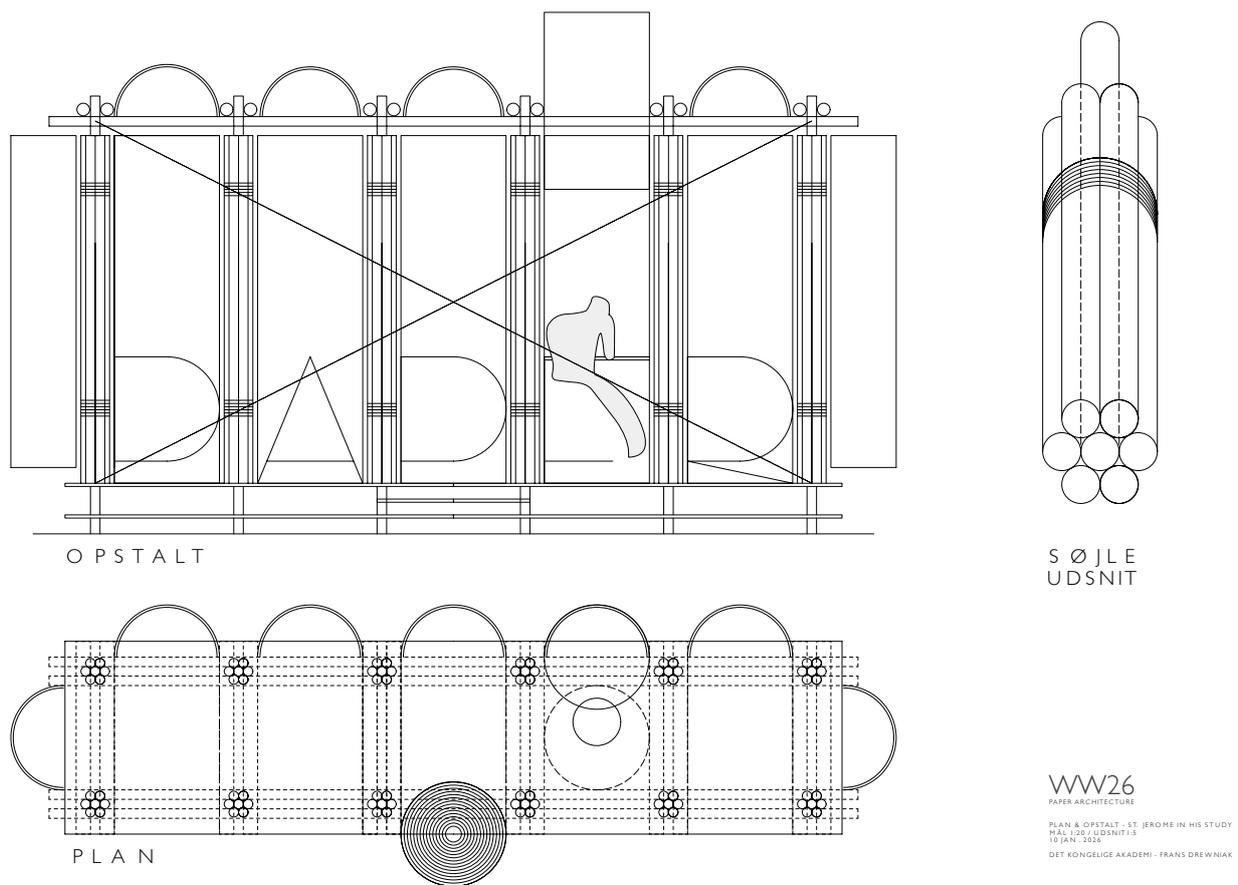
Paper architecture - Saint Jerome in his study. Plan, elevation and detail © Frans Drewniak
